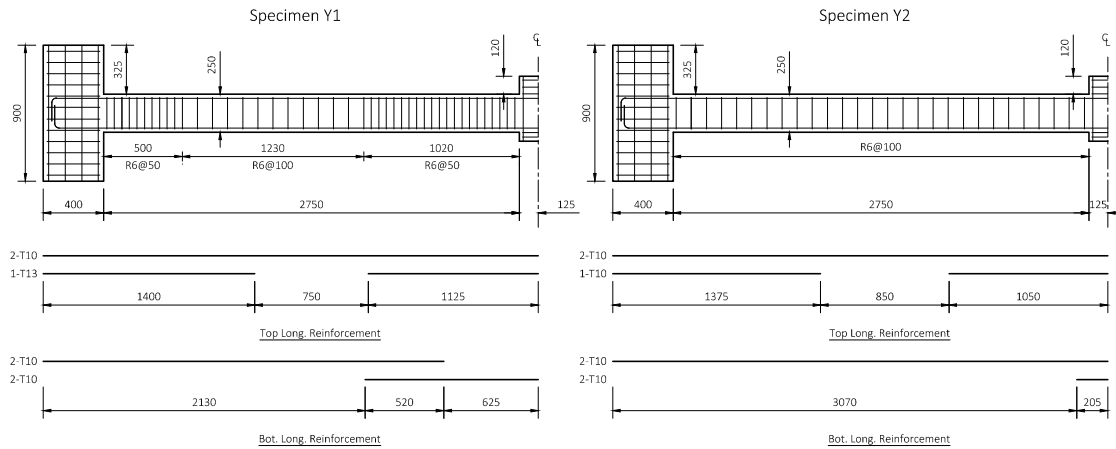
Geometric and reinforcement layout of specimens, adapted from Yu (2013).
